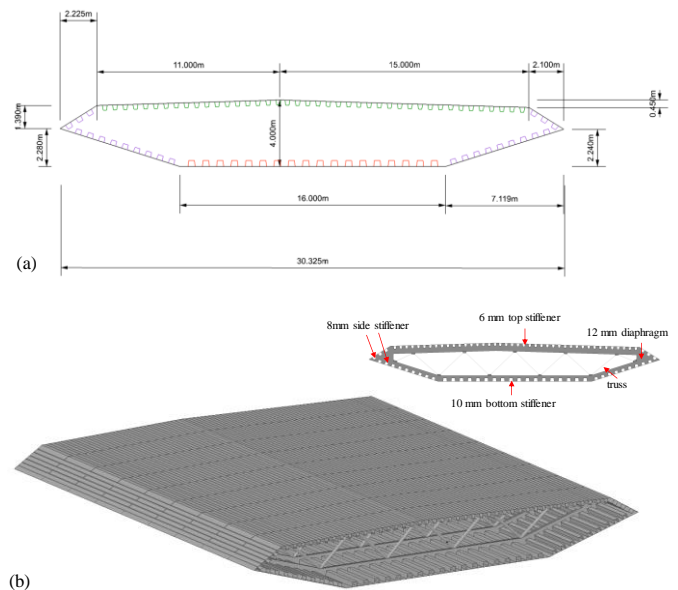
Bridge girder, a) cross section dimensions, b) finite element model.
